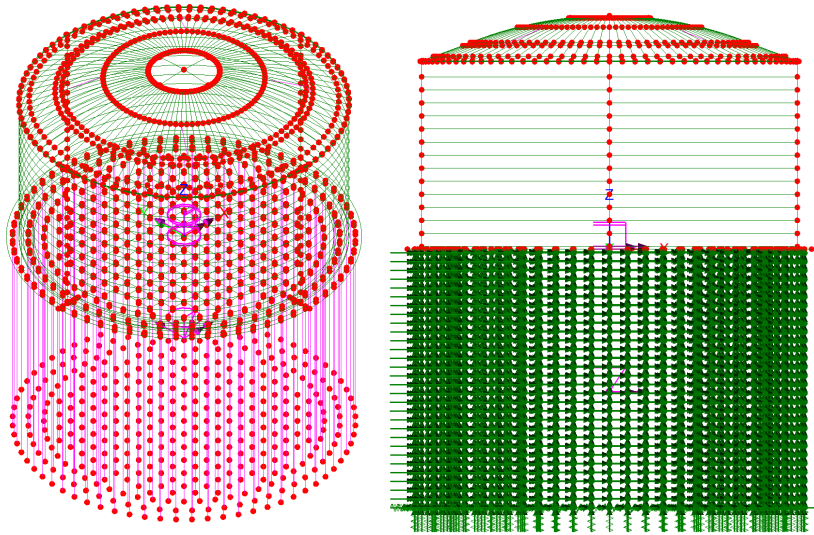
Support Condition for a 3D Shell Model (Pile Support(Detailed foundation))
